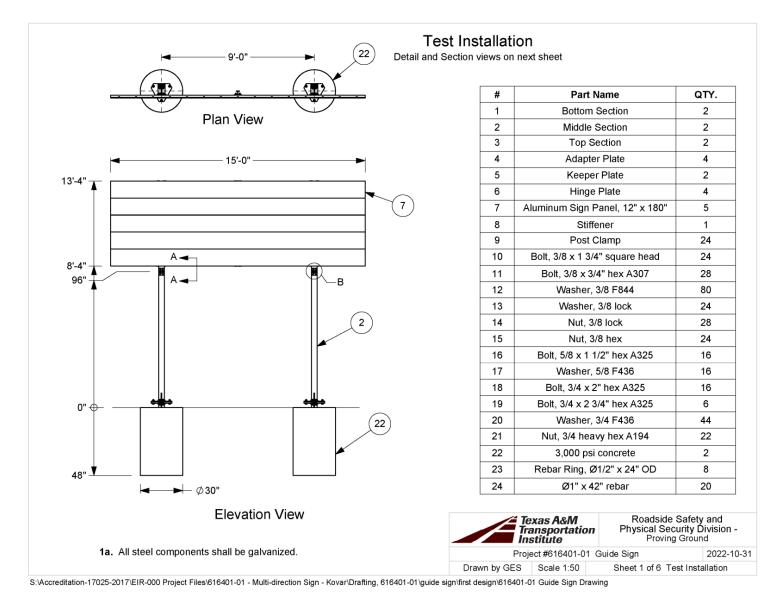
Details of Guide Sign with Large Sign Supports for Test 616401-01-3.
